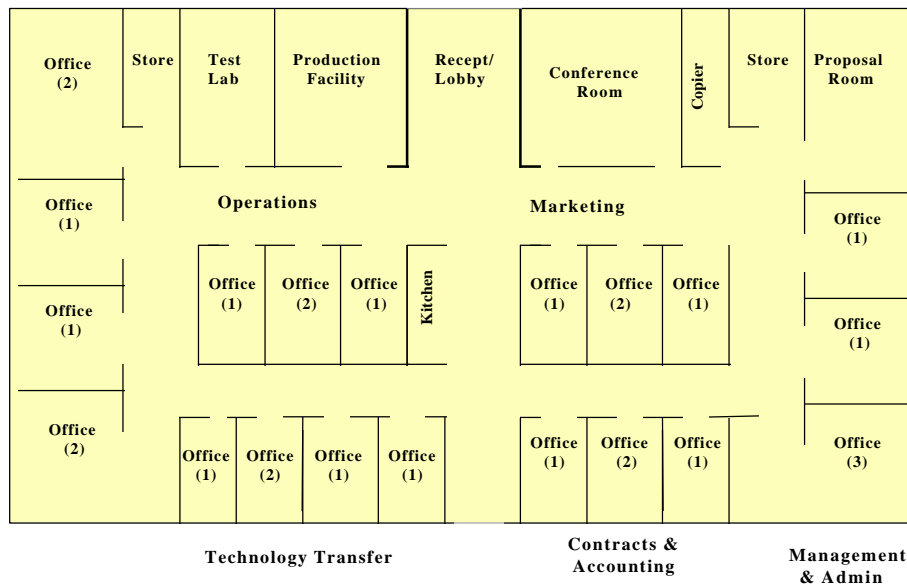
Proposed Facility Layout for the MOCC
